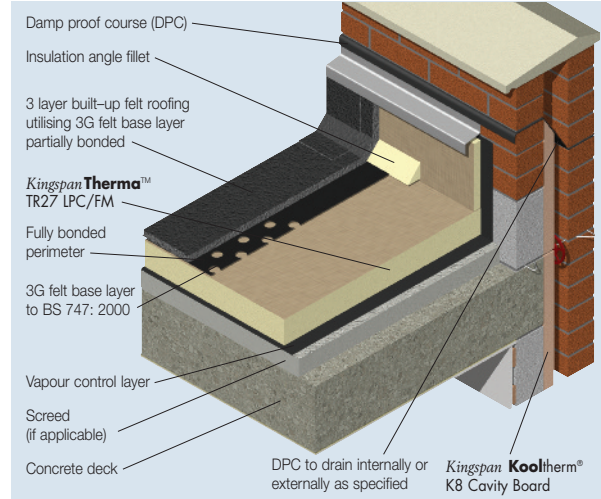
Dense Concrete Deck With Suspended Ceiling – Partially Bonded Built-Up Felt Waterproofing
